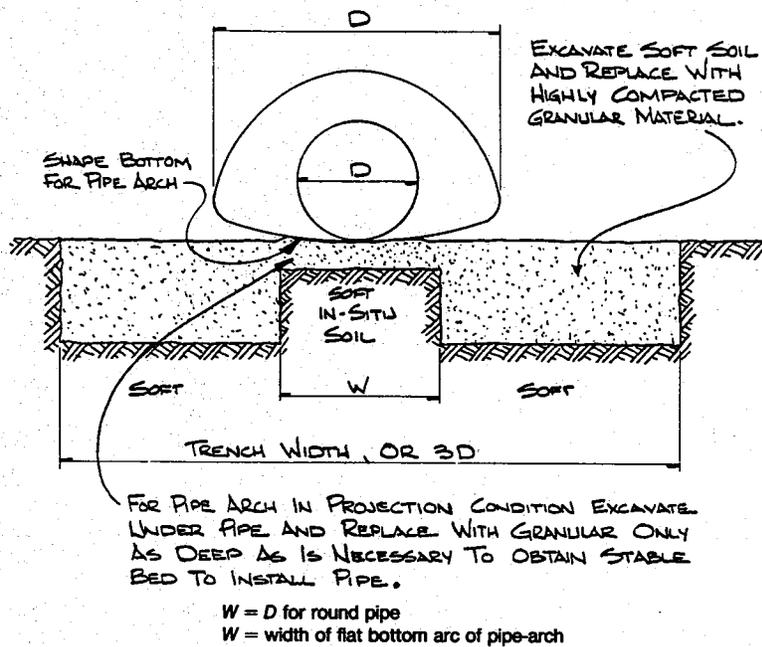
Soft Foundation Treatment for Larger Pipe and Pipe-Arch
